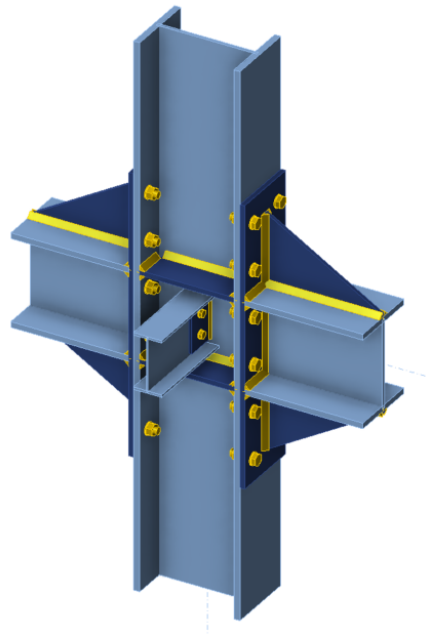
Detail of a rigid connection used in the model building. Column: HEB450; Main beams: HEB300; Secondary beams: IPE240 Table 6.7
